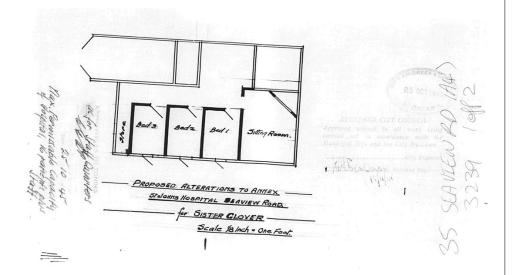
Proposed changes to the internal layout of the dance hall to provide hospital staff accommodation in 1945 (AKC 339 Building Permit and Consents Aperture Cards 1908-1997, Auckland Council Archives).
